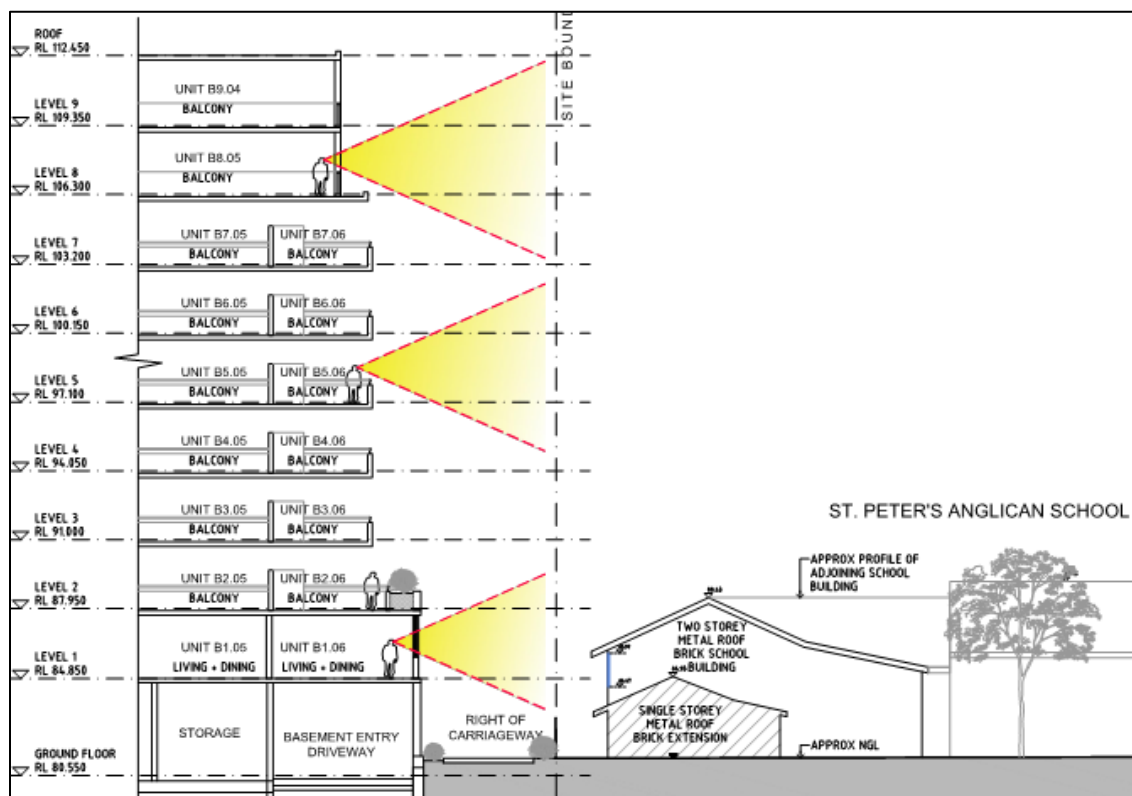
Location of building showing overlooking potential to adjoining school buildings and playground
